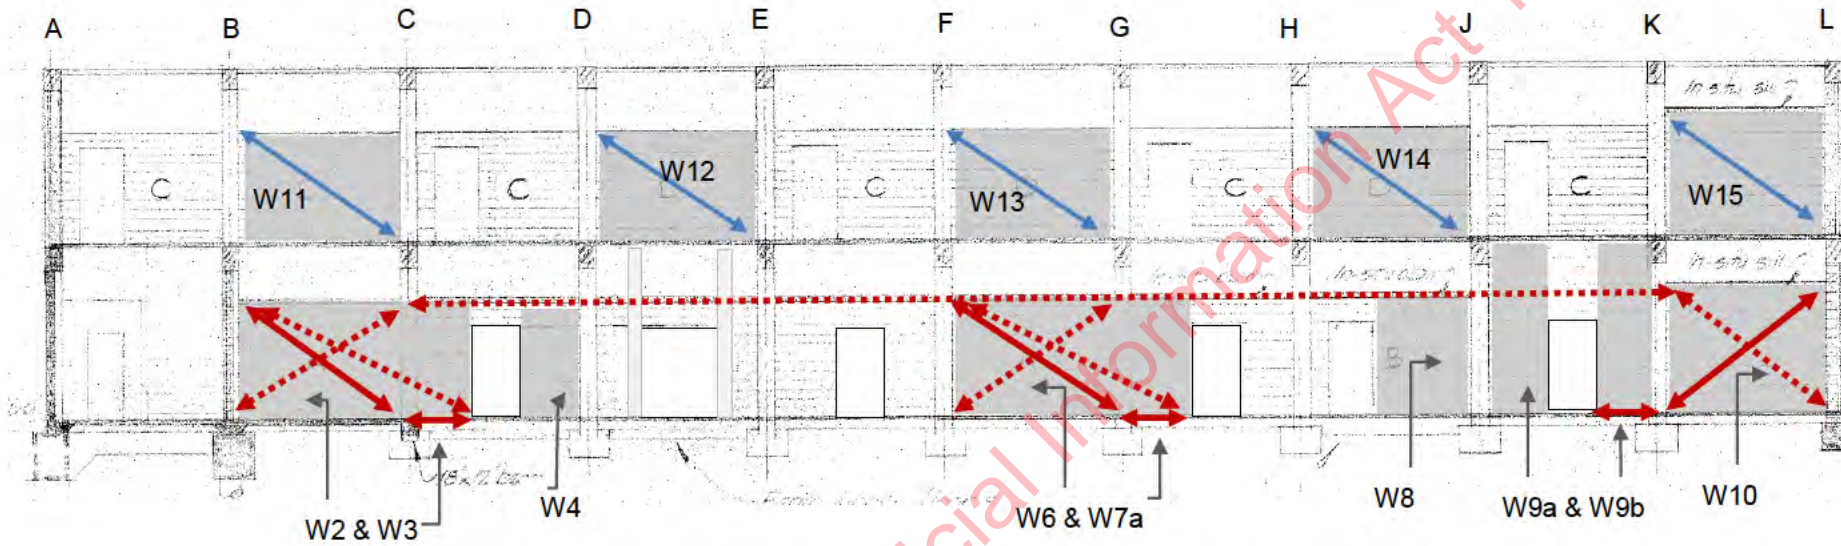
Lateral Load Resisting System - Longitudinal Direction
